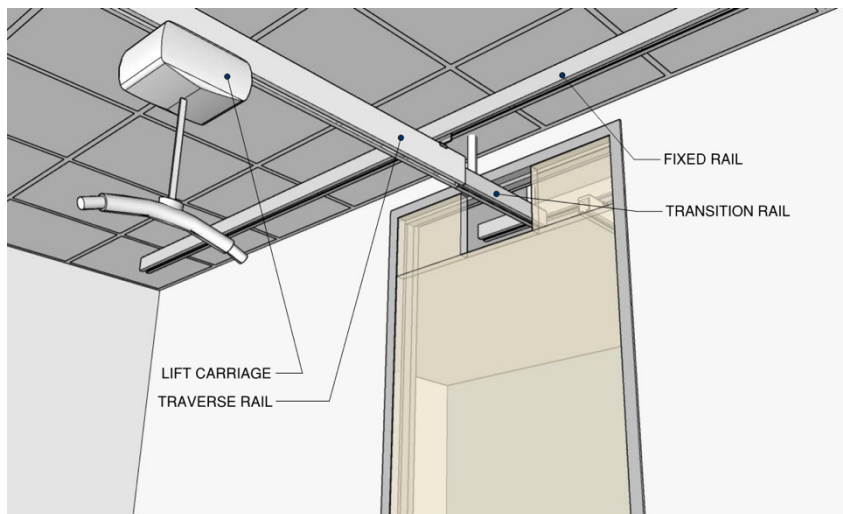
In this example, the transition rail can be mounted below the frame, and a standard 7'-0" door can be used with transom panels provided to enhance patient privacy. Although this configuration provides less privacy between rooms, it is the easiest to coordinate with the lift systems.
